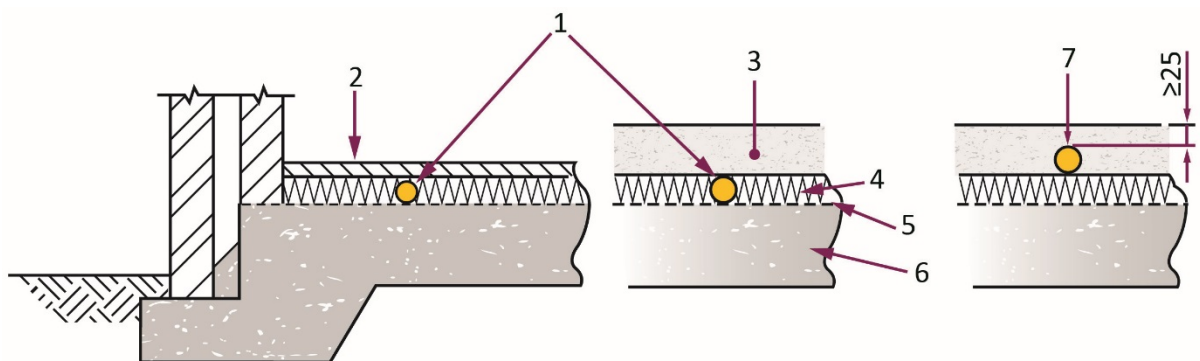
Typical examples of internally buried pipework (Suspended Concrete Floors)
